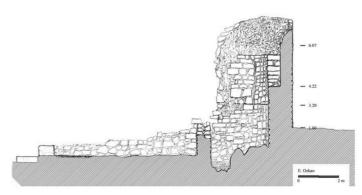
The North-south section cross (Excavation Archive, E.Özkan).
